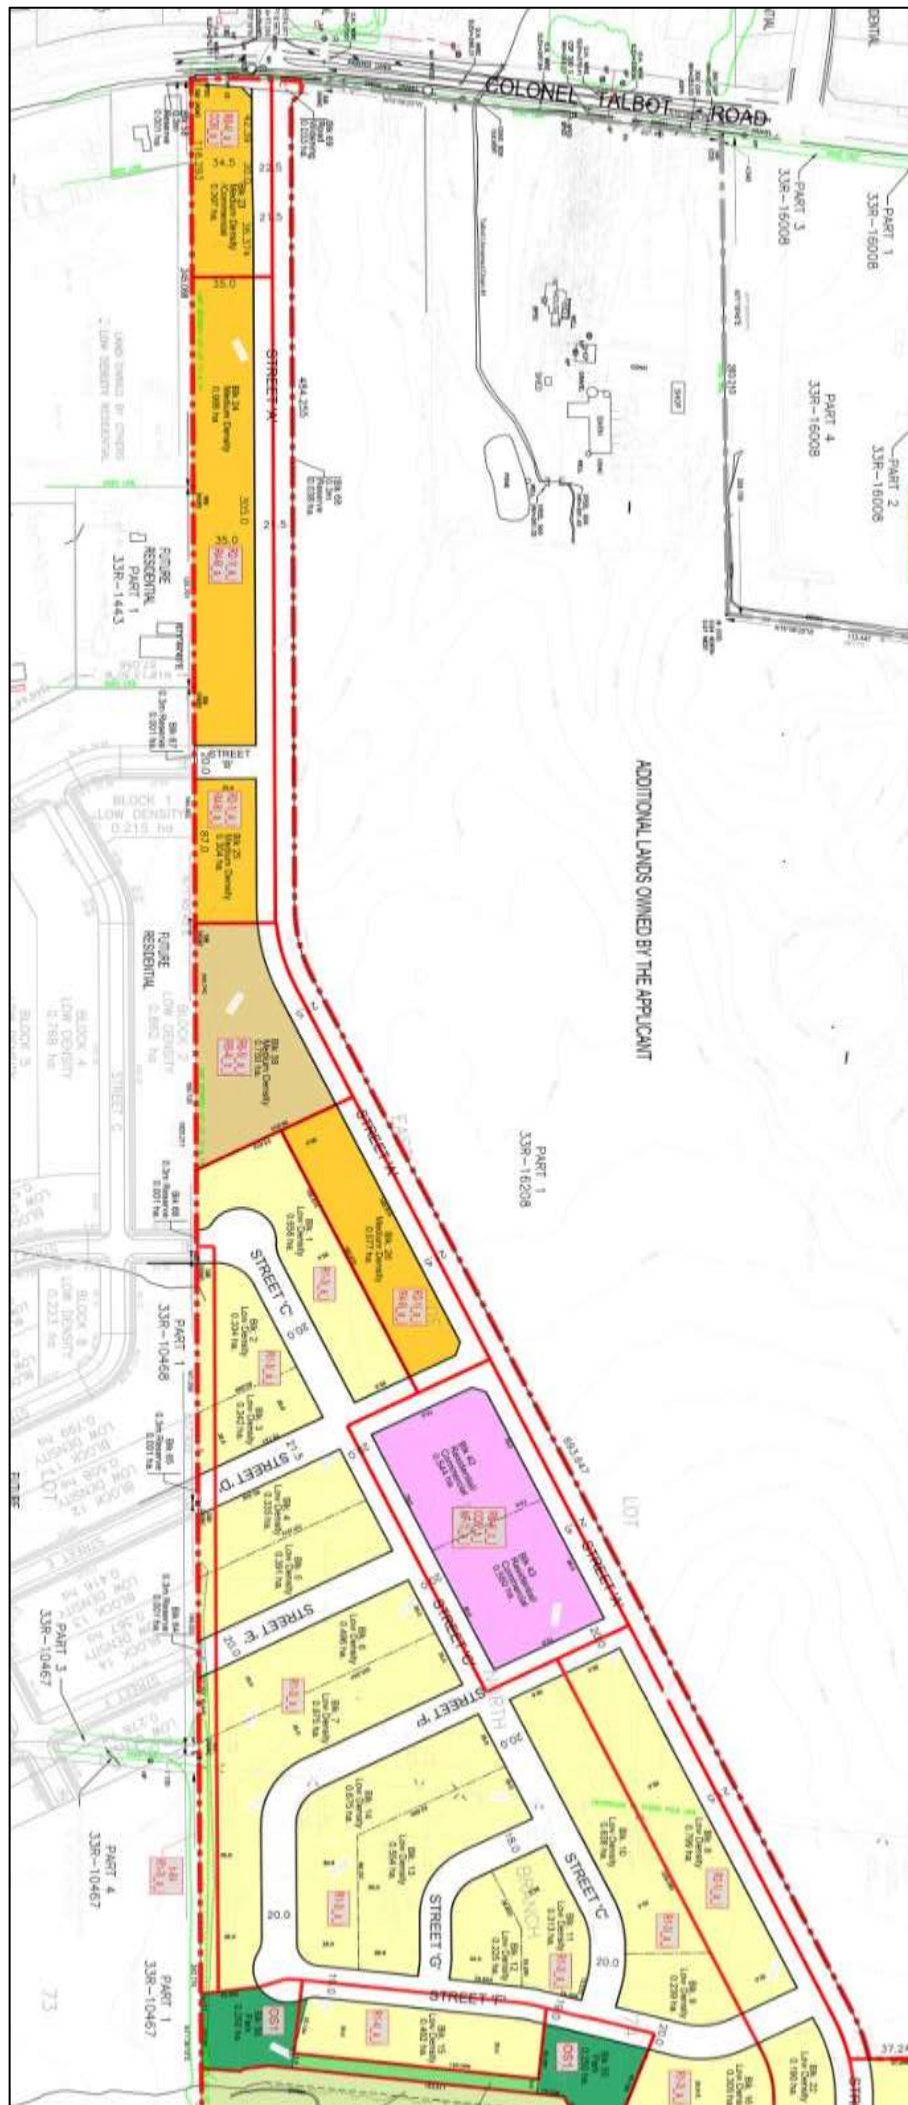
Western (North Lambeth) portion of subdivision, with zoning
